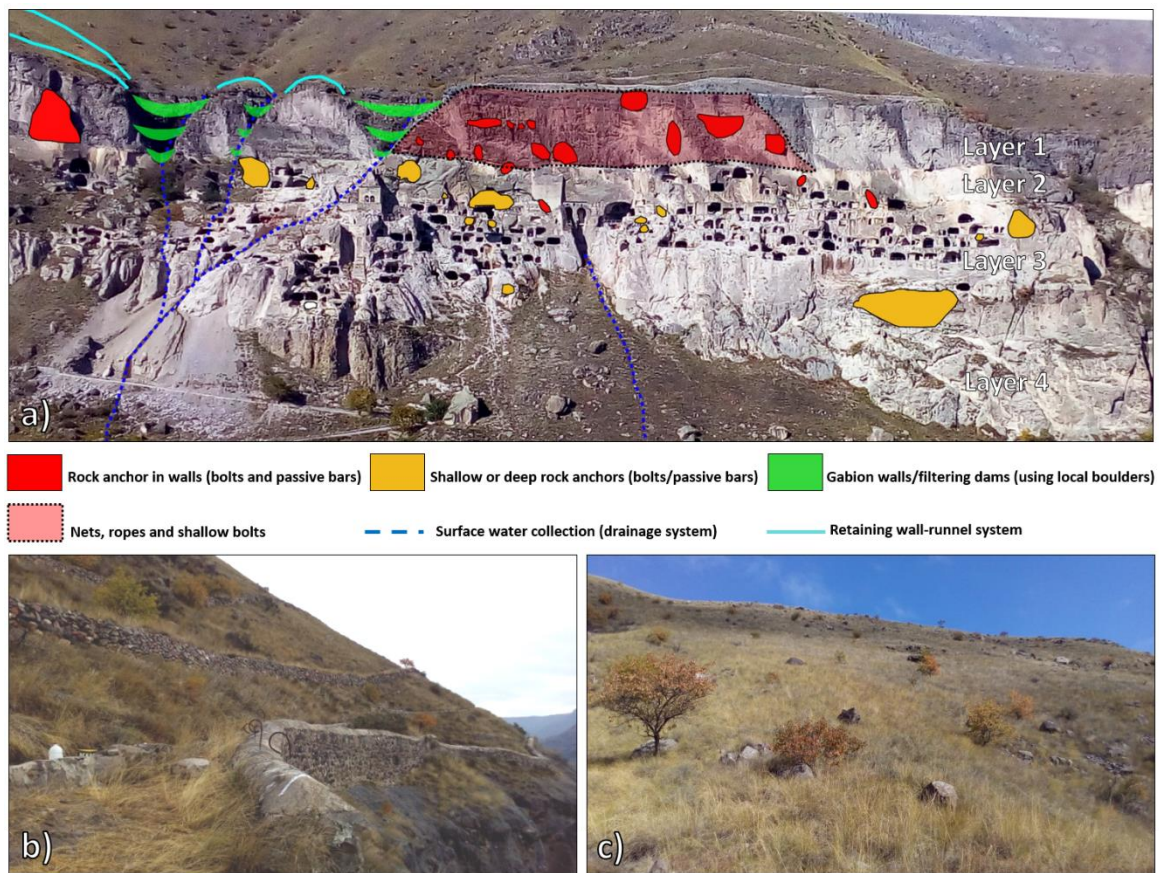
(a) Contribution to the General Master Plan of the proposed mitigation measures for the whole Vardzia Monastery: system of surface water collection and runnel-retaining walls built along the monastery slope rock wall upper sector (modified after [17]), sectors characterized by instability on the rock cliff with related anchor type, (b) Water draining structures in Vardzia formed by the runnel-retaining wall system, (c) detail of scattered boulder of the upper slope sector.
